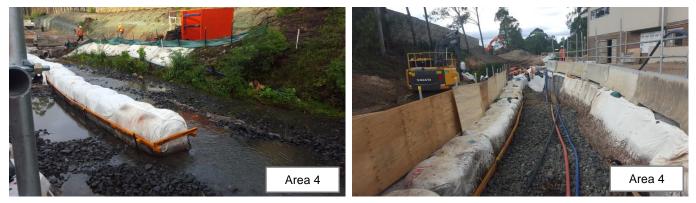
Commencement of installation of bulka bag wall for the creek realignment, following a rain event. Photo 50: Installation of bulka bag and plywood fencing along area 4, during a temporary creek diversion around the works (the 3 pipes along the rock)
